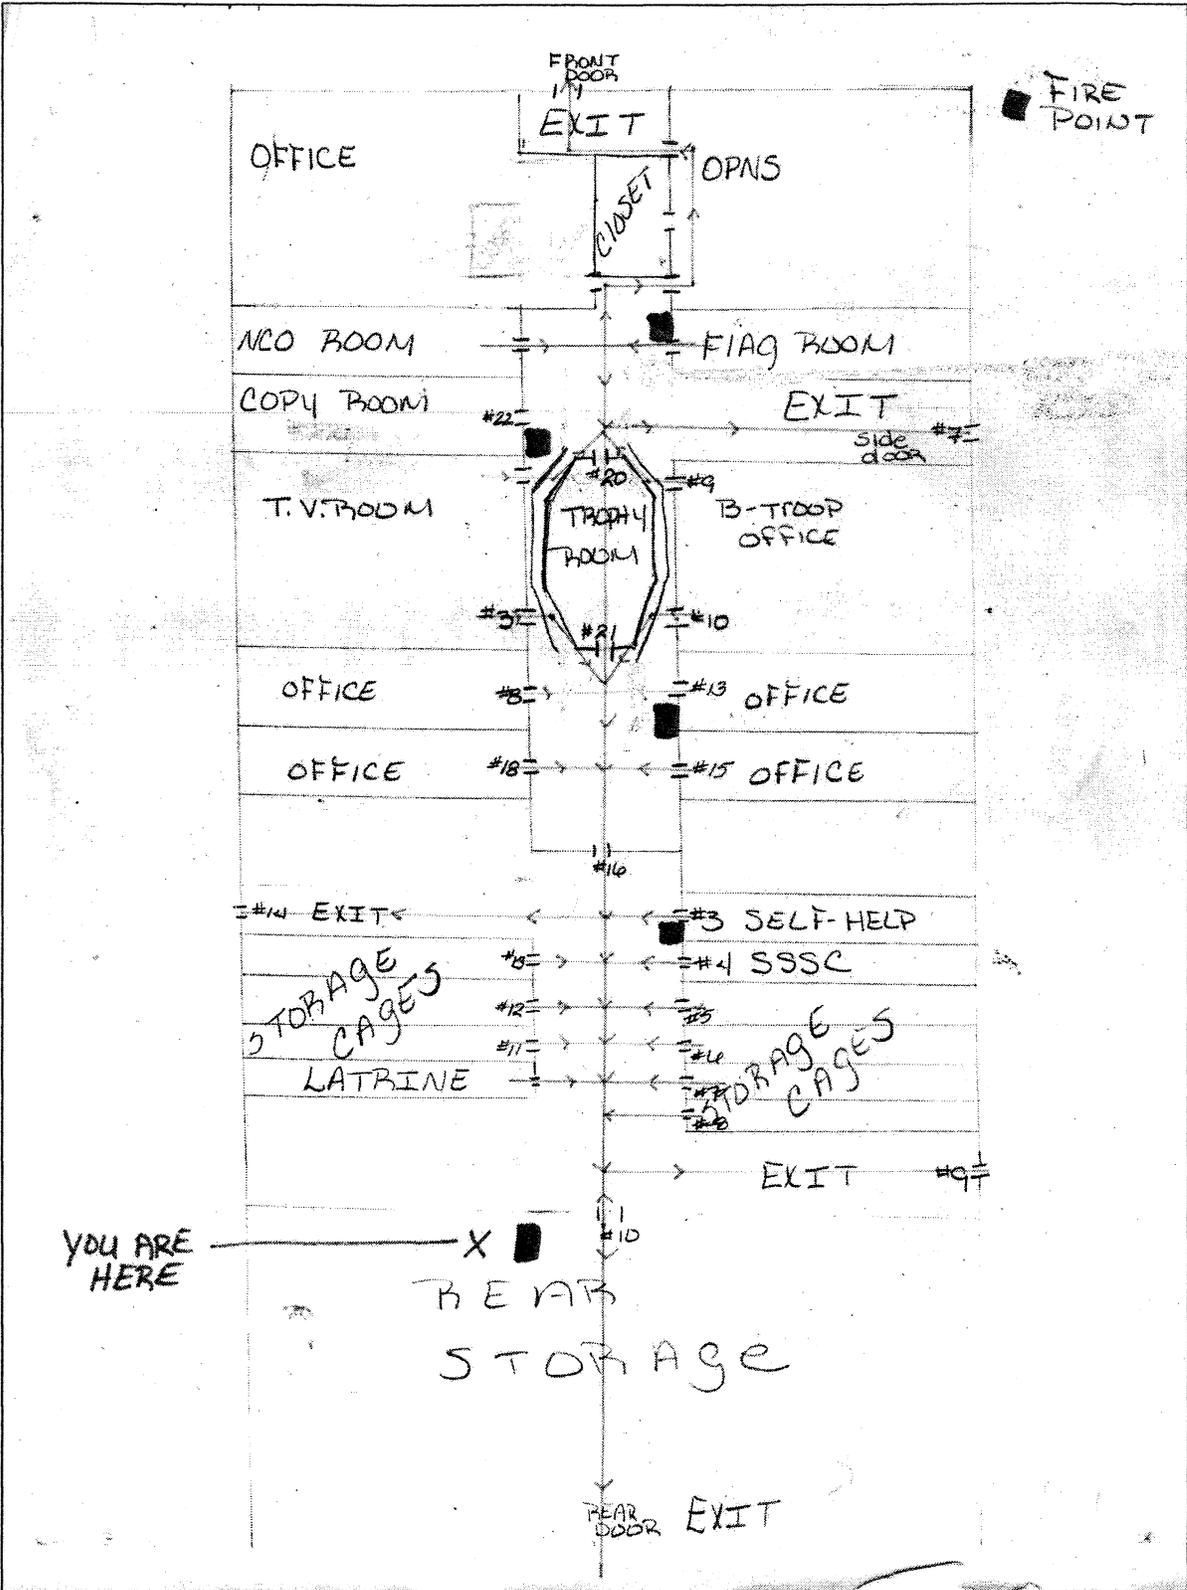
"EVACUATION PLAN, BLDG. 30026." A FIRE ESCAPE PLAN, 1982 OR LATER.
